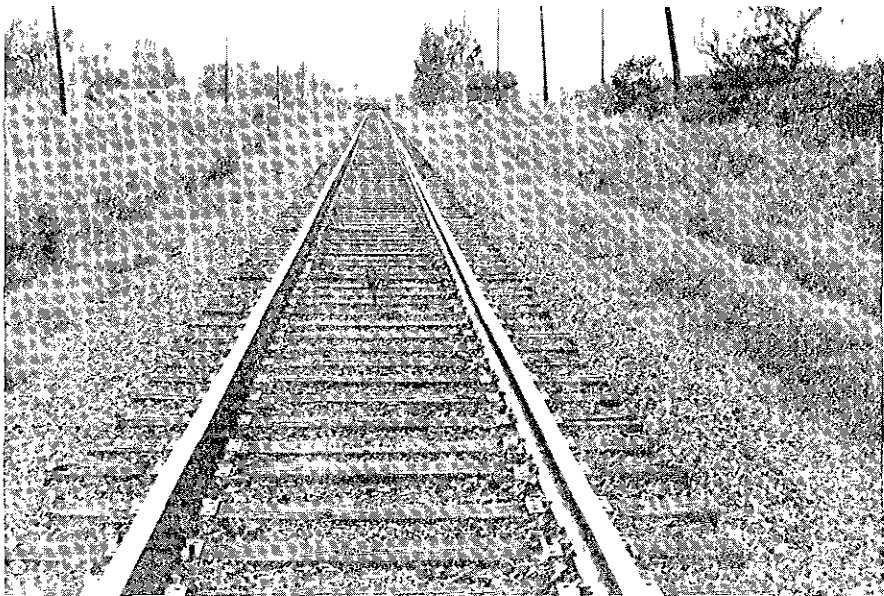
View to the west of SCL railroad tracks from 600 feet east of crossing.
